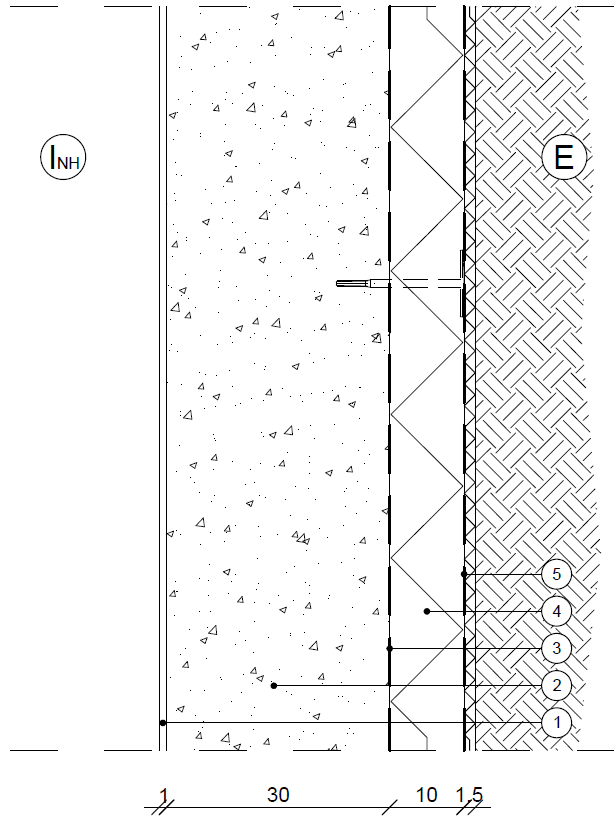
Exterior wall assembly W_E_41_C (insulated retention wall)
